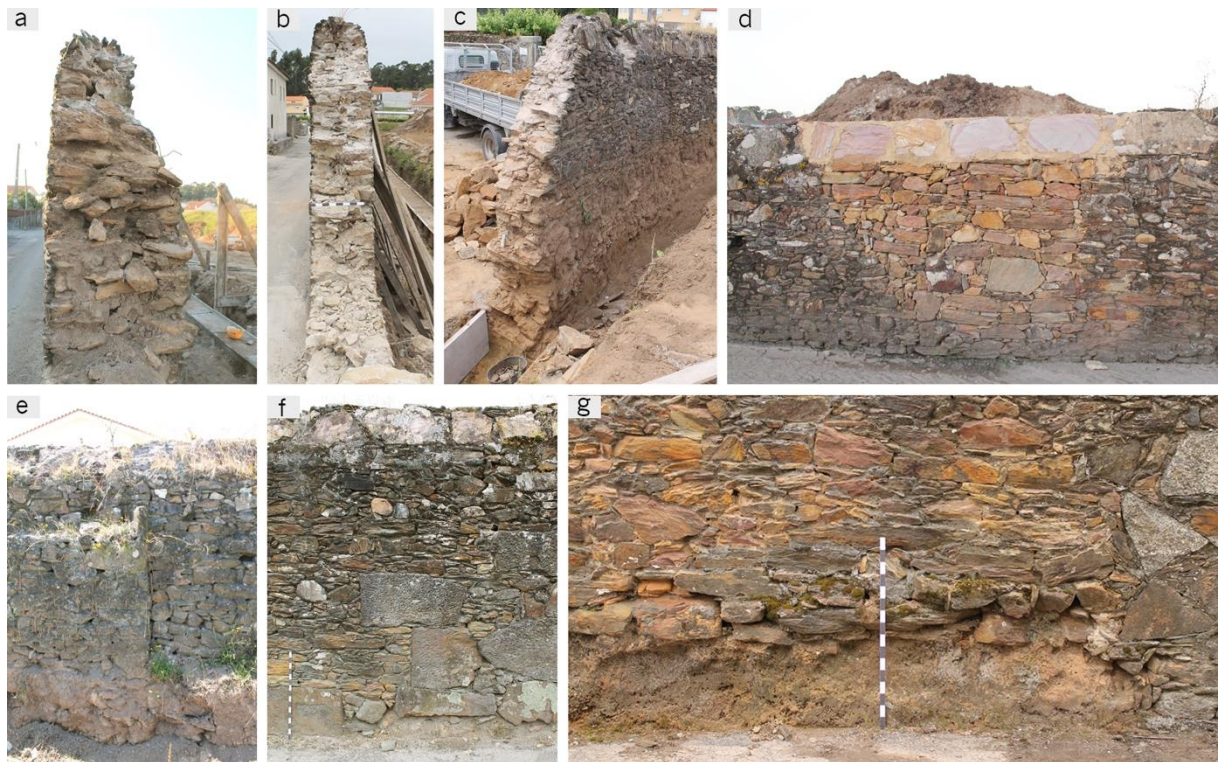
Images from the case study constructive irregularities: (a) deformed cross-section built with granitic soil; (b) cross-section built with clayey soil mortar; (c) stretch of farm wall with terrain retaining functions; (d) deep repairing intervention; (e) wall section show different cross-section thicknesses; (f) superficial masonry texture irregularities; (g) area with different types of foundation building quality (rebuilt area of the farm wall).
